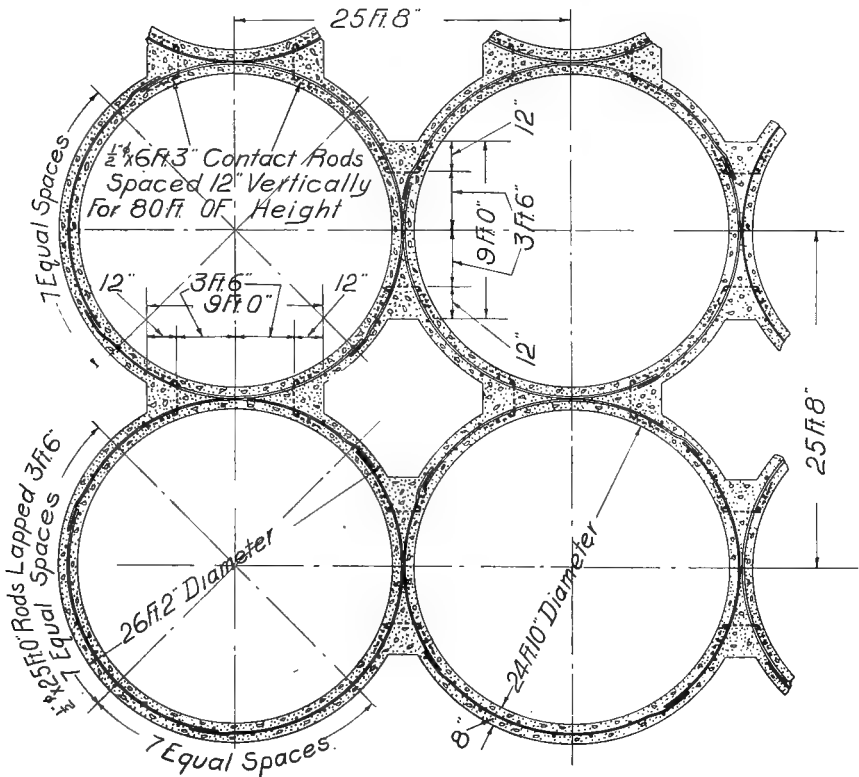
SECTION THROUGH BINS, TYPICAL CONCRETE GRAIN ELEVATOR.
